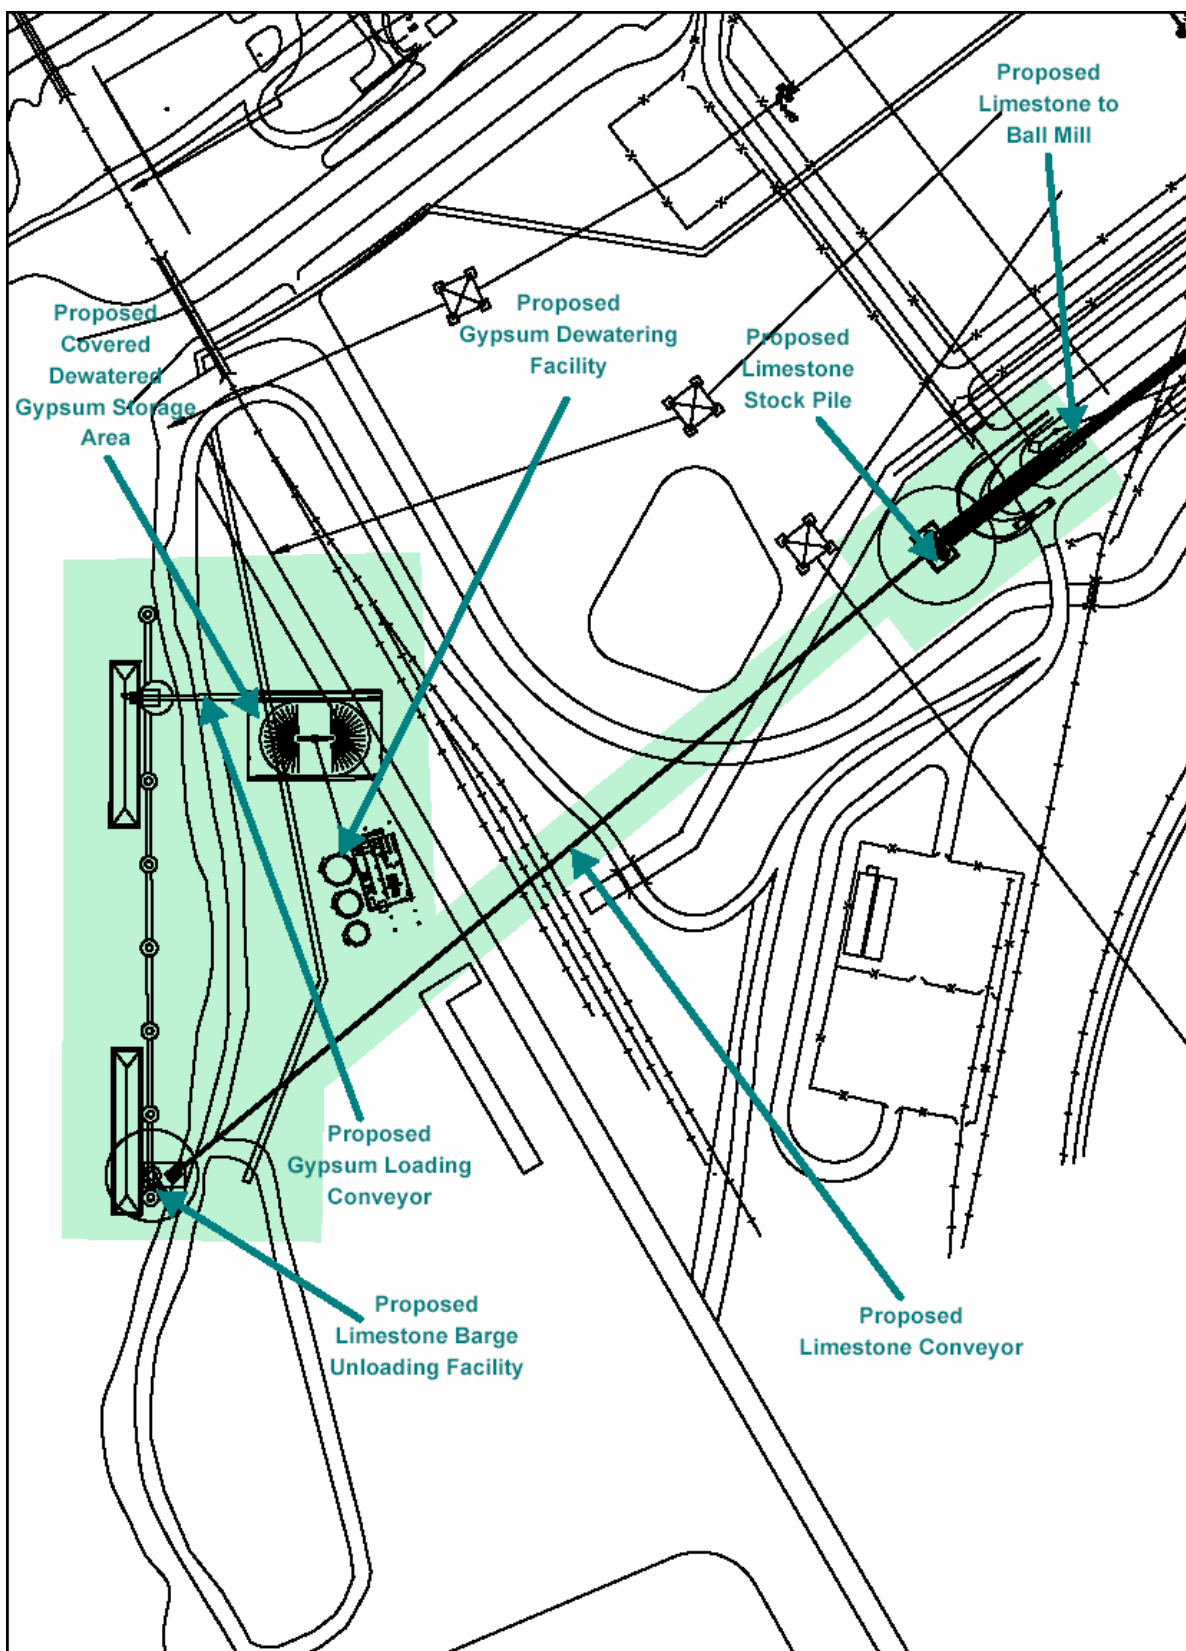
Barge Facilities for Unloading Limestone and Loading Dewatered Gypsum (Option 2 - Delivery by Barge)
